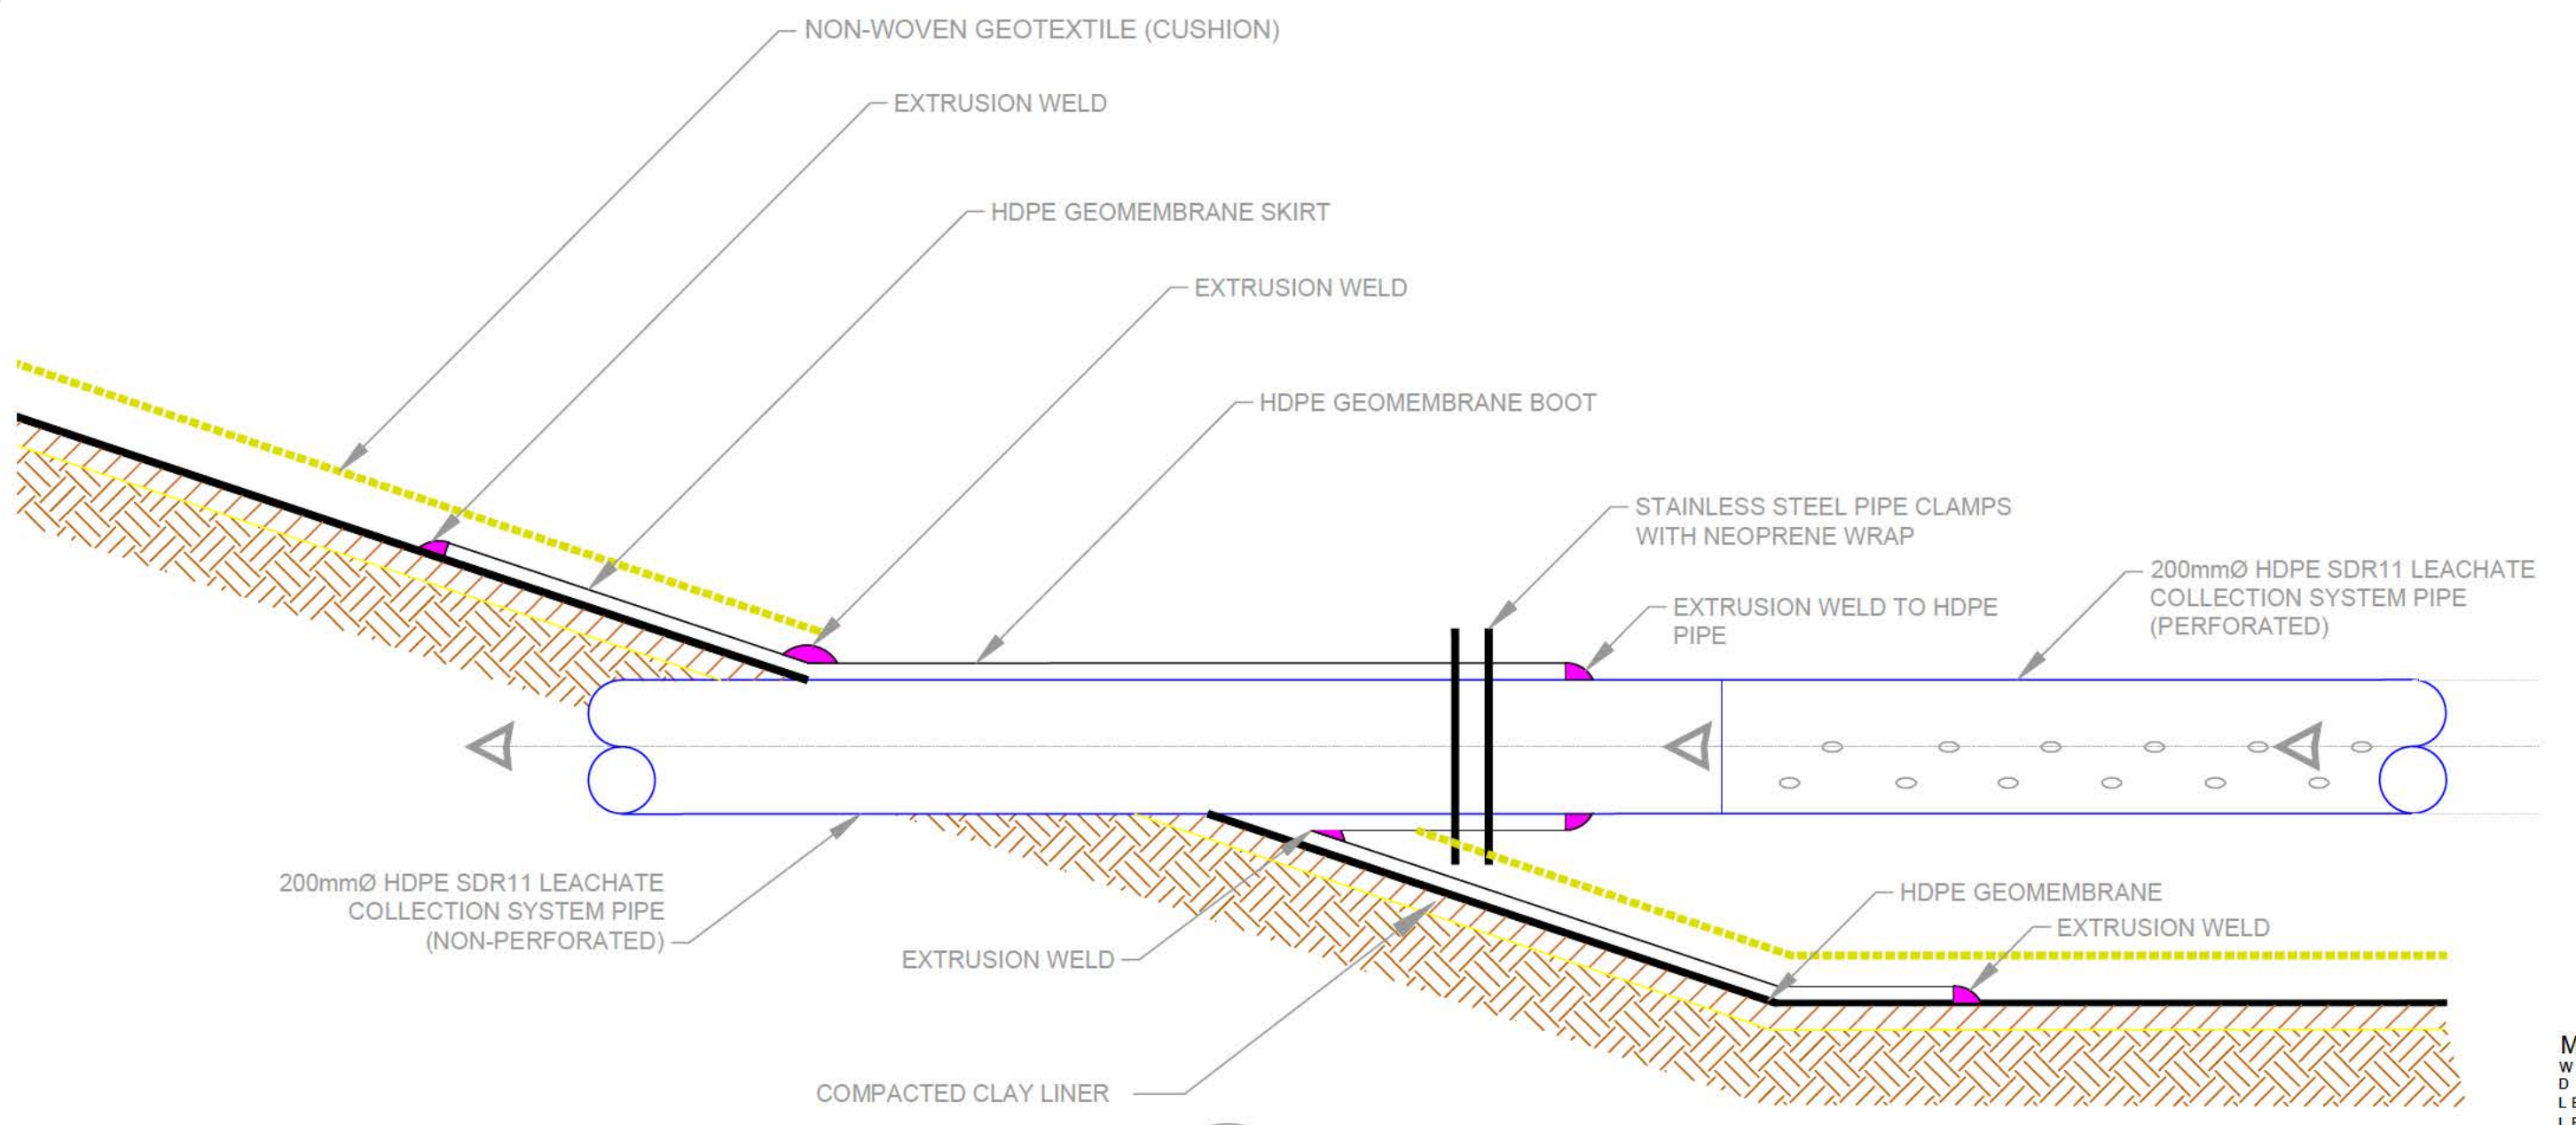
LEACHATE COLLECTION SYSTEM CLEANOUT RISER PIPE TO LEACHATE COLLECTION SYSTEM MANHOLE (IN TRENCH)
